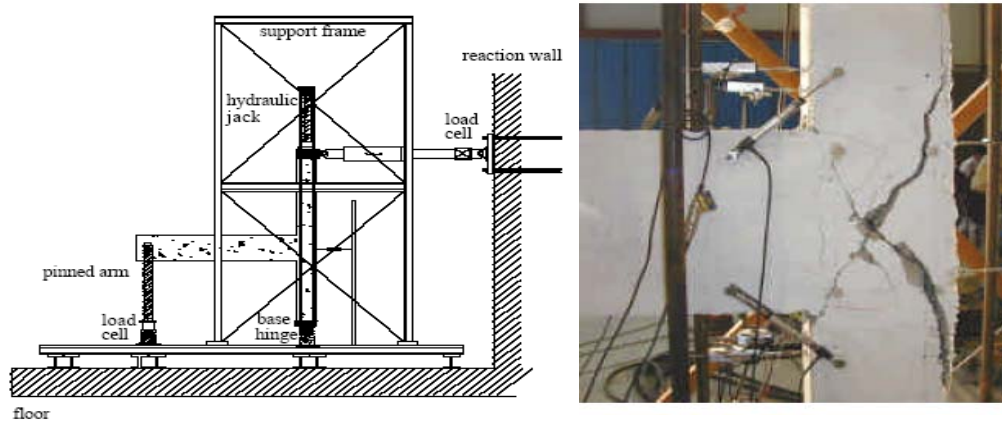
Test set-up and joint shear failure of as-built subassembly [Pampanin, Calvi and Moratti, 2002]
